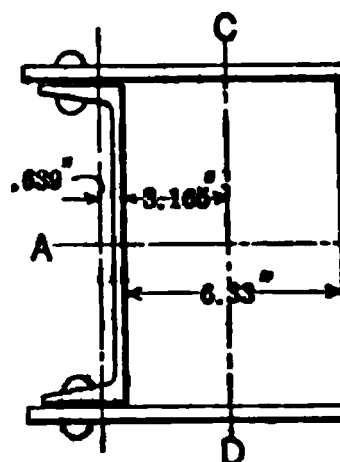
Moment of Inertia of Cross-section of Channel Box Column
